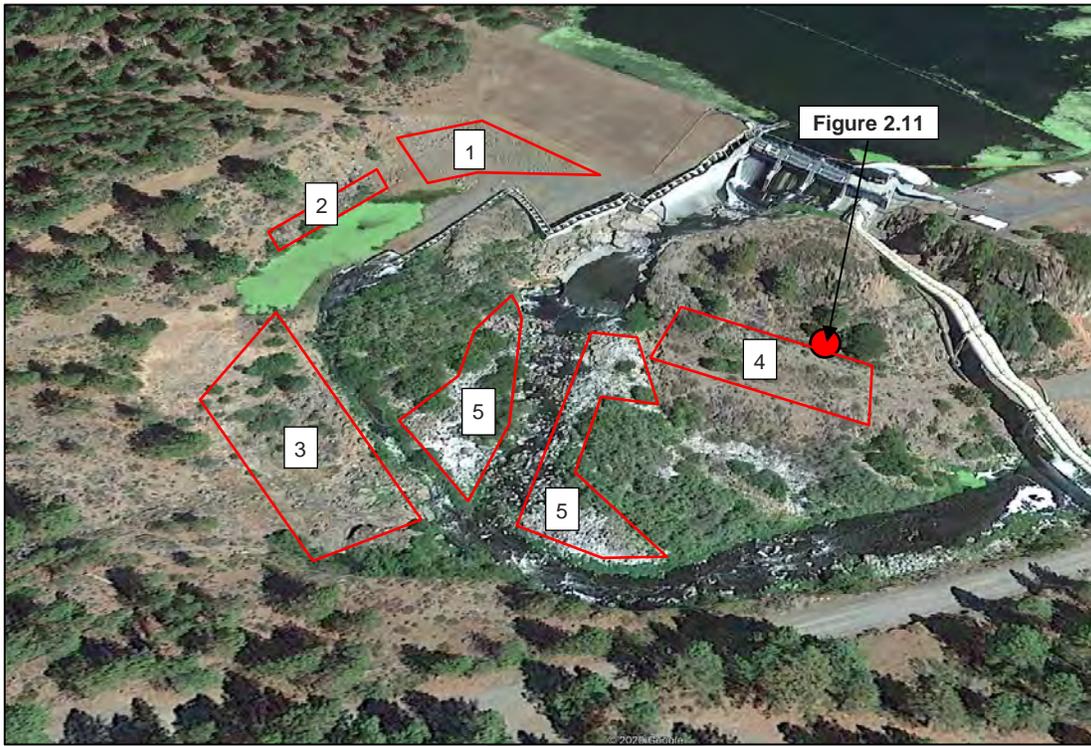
J.C. Boyle Downstream of Dam Potential Borrow Source
